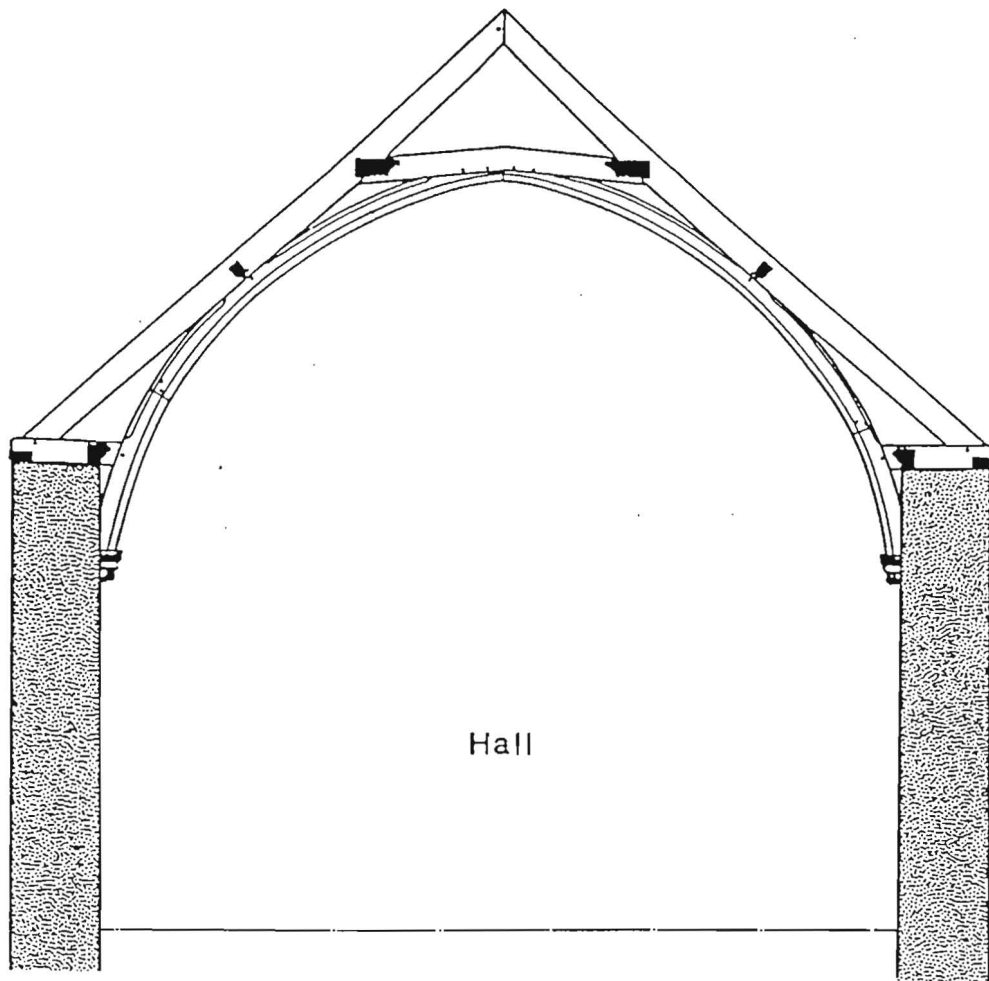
Section of the Great Chamber roof looking north to show sample locations
